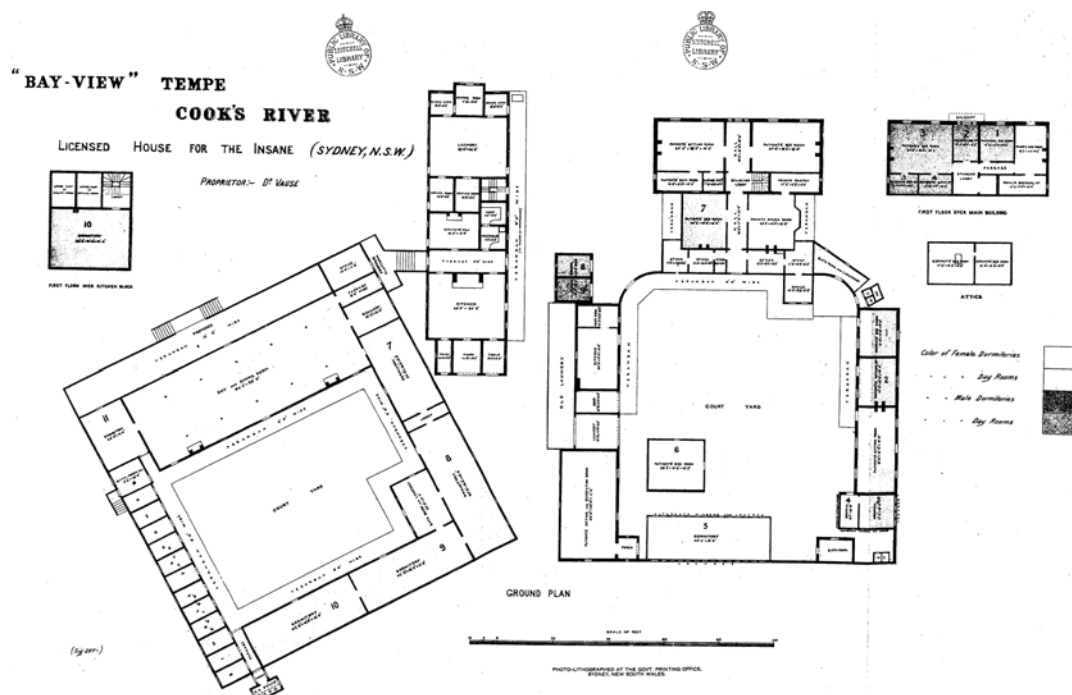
1894 plan showing the proposed extension and new building to be built at the Bayview Asylum. The new building was roughly the same size as the existing portion and included new dormitories, rooms and amenities with a two-storey kitchen block attached. (Source: Royal commission papers)
